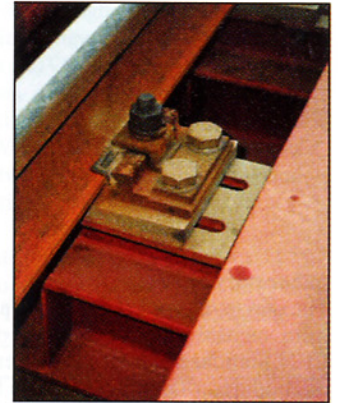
Picture of the stiff rail fastening in use *before* modification of the auxiliary railway bridge (Photo: W. Weißenberger, Müller-BBM)
